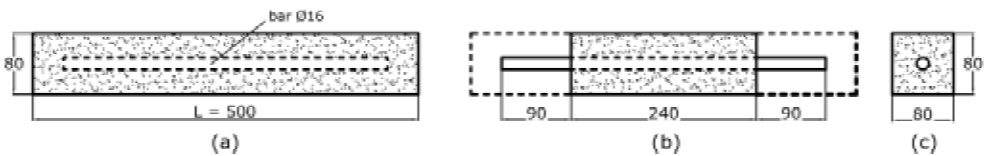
Geometry of the reinforced specimens: lateral views of the specimens used to investigate spalling (a) and tension-stiffening (b); and cross-section (c);  $L = 500$  mm. Same geometry for the unreinforced specimens used only to investigate spalling ( $L = 450$  mm).
